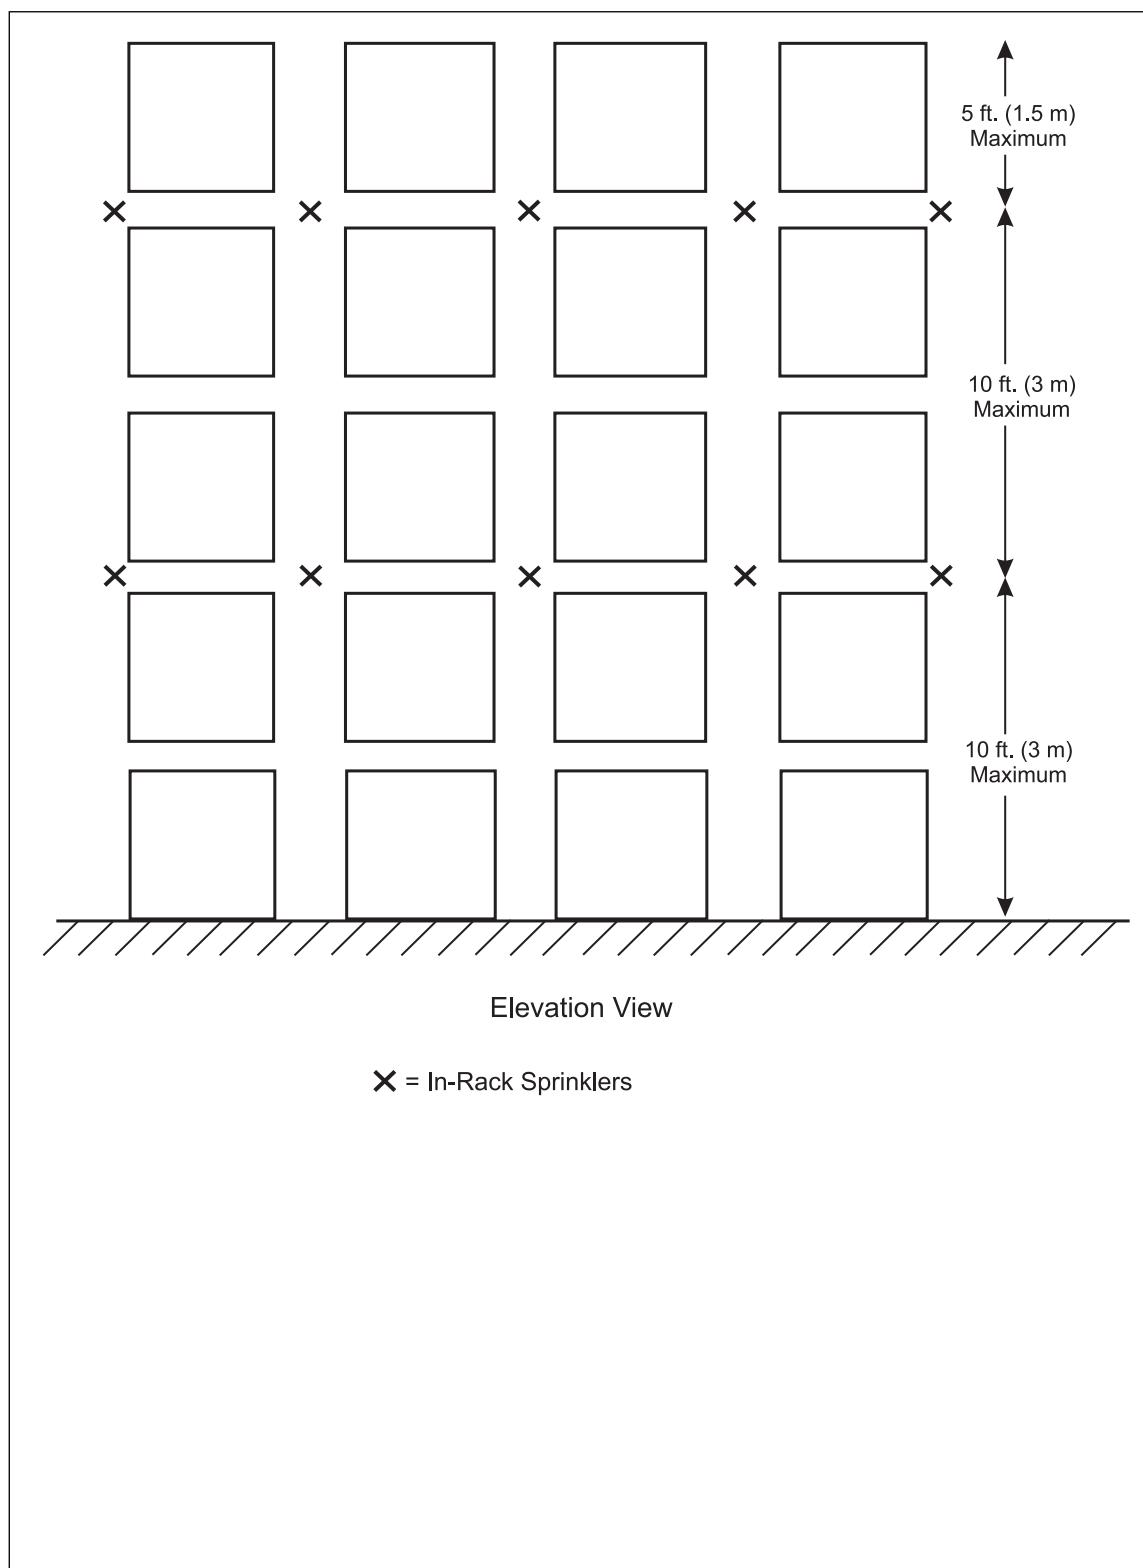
Multiple-row rack sprinkler layout: quick response sprinklers protection scheme (elevation view)
